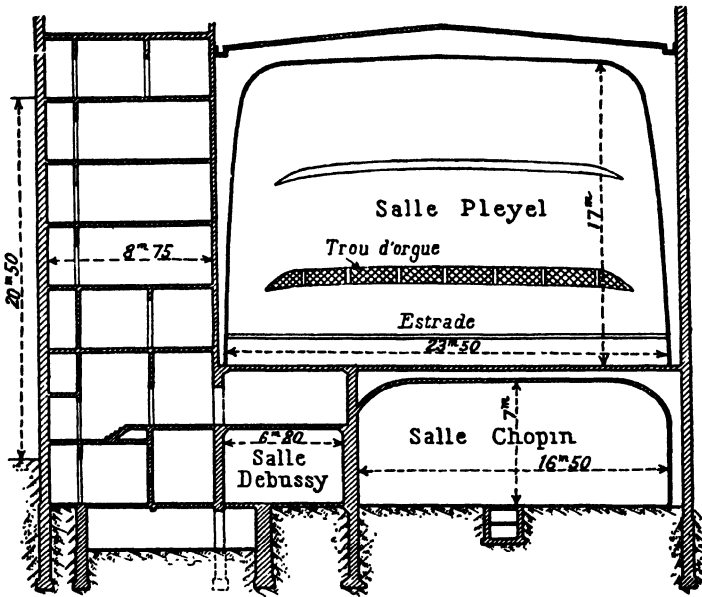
Cross section of Salle Pleyel, showing the inclination of the side walls.
